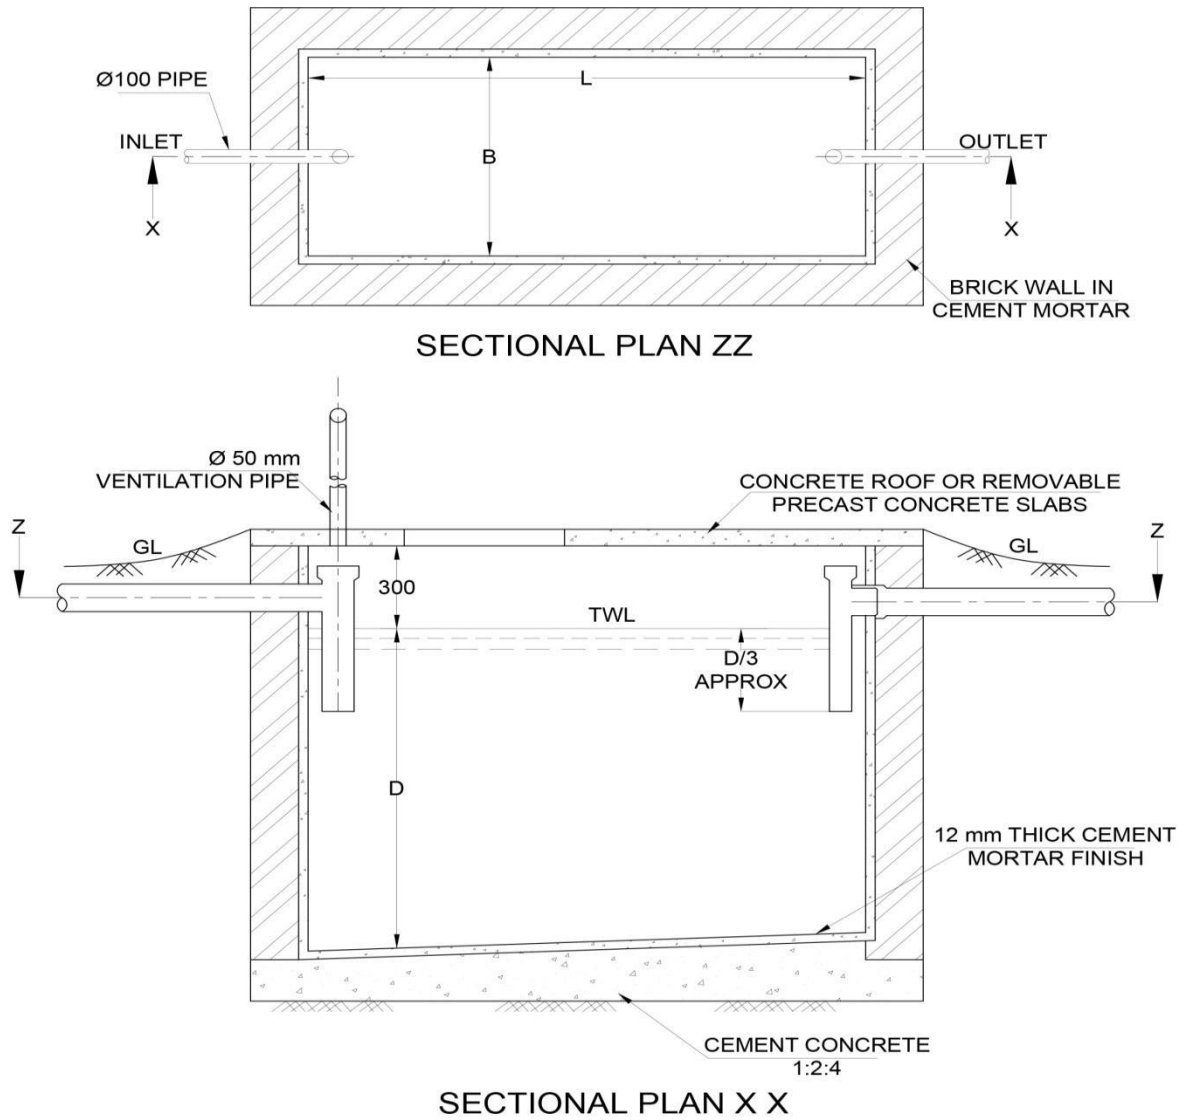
TYPICAL LAYOUT OF A SEPTIC TANK SEWERAGE SYSTEM
